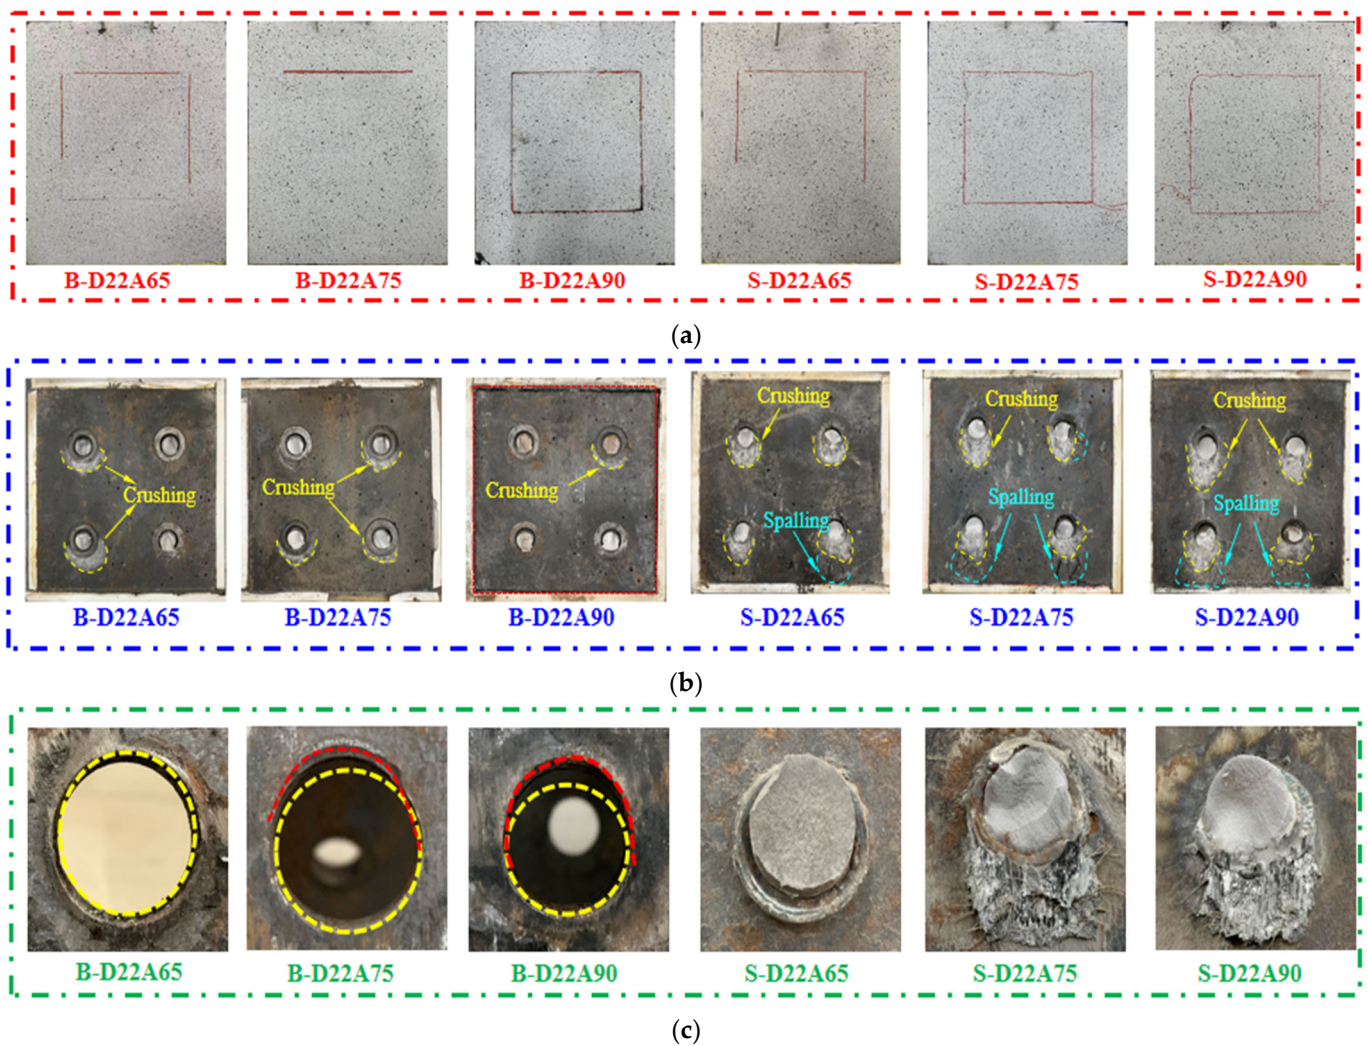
Failure modes of samples. (a) Crack patterns on outer slab surfaces. (b) Crack patterns on inner slab surfaces. (c) Installation position of shear connectors on steel beams.
